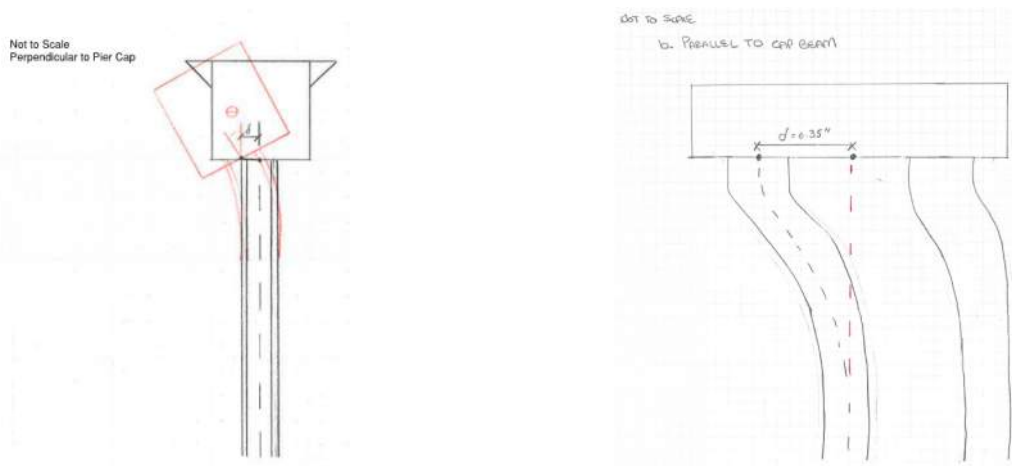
Deflected Pile Shape Subject to: a. Loading Perpendicular to Pile Cap; b. Loading Parallel to Pile Cap
